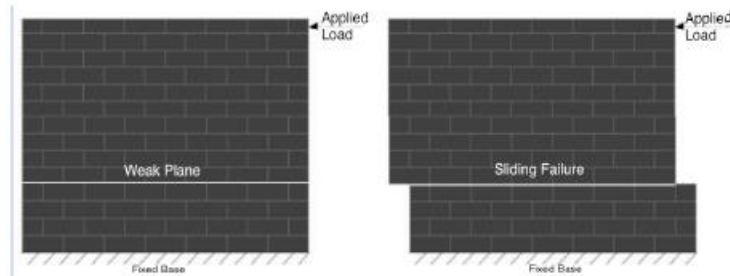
Shear Slip due to a weak plane between masonry layers
